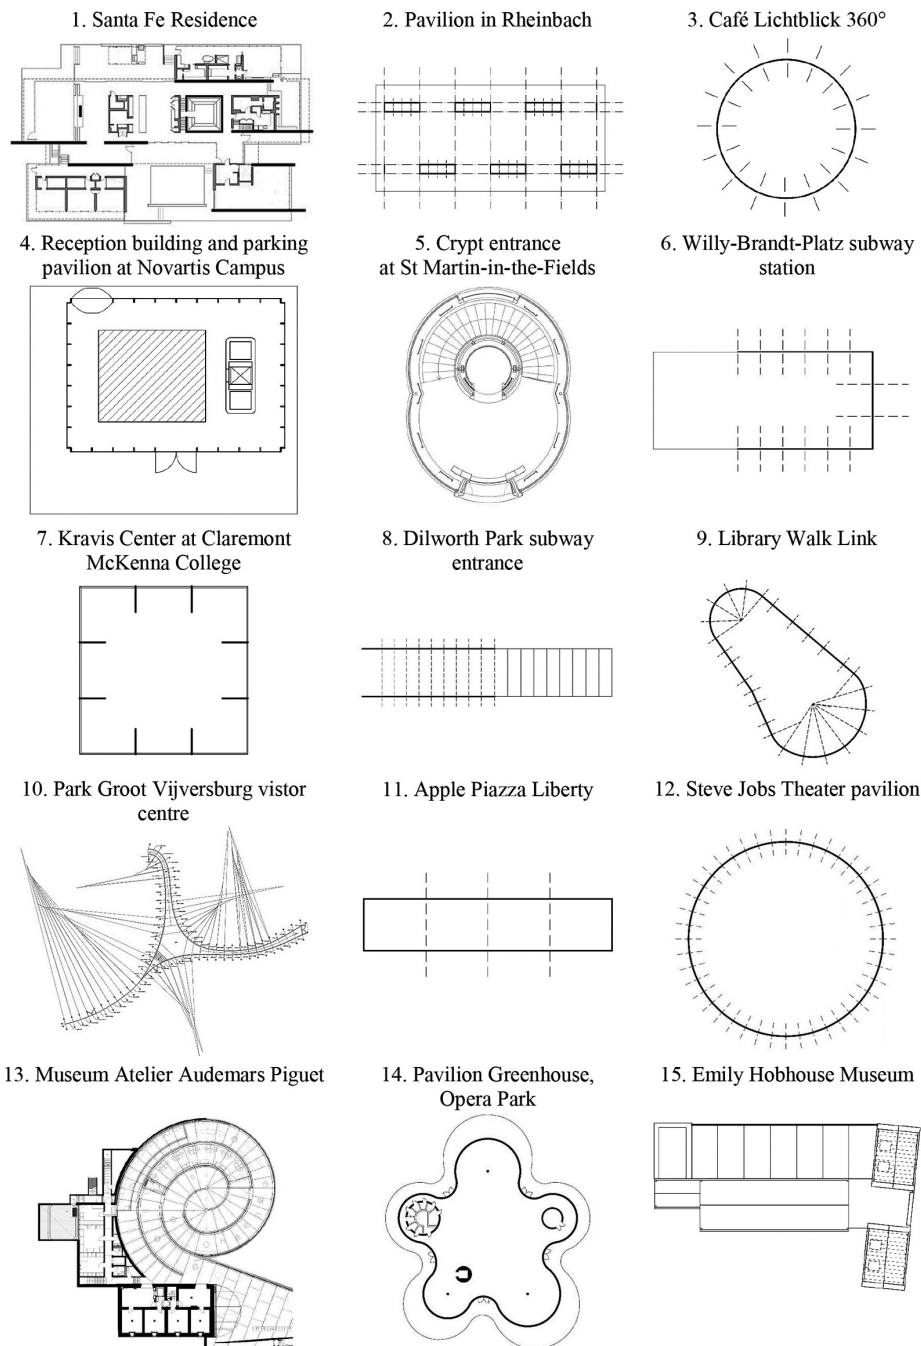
Arrangement of glass load-bearing walls – plans based on architectural drawings (without scale between buildings)
